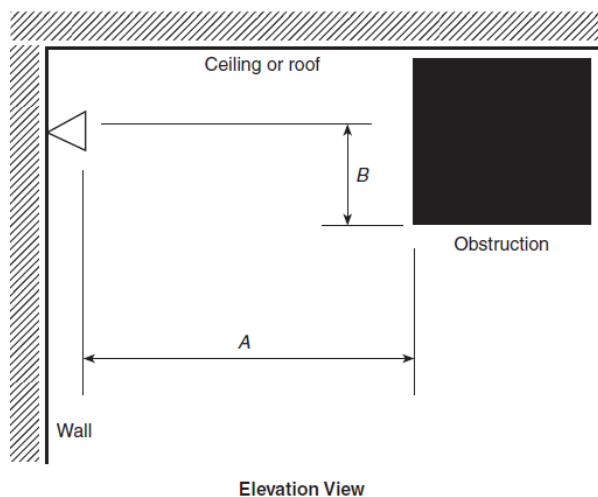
Positioning of Sprinkler to Avoid Obstruction (Standard Sidewall Spray Sprinklers).
